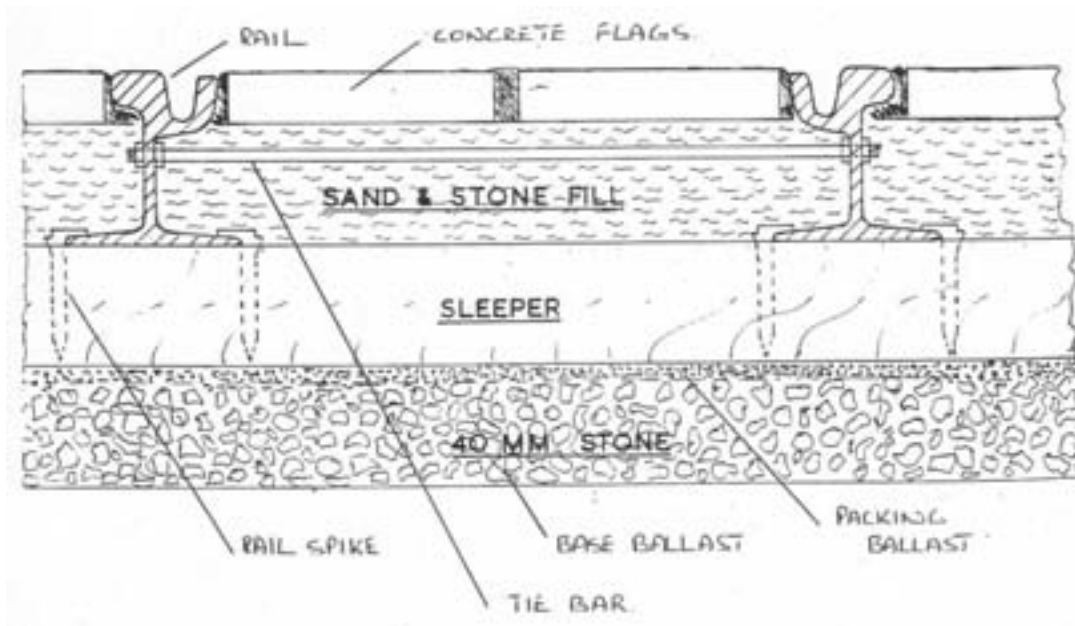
Schematic diagram of Blackpool and Fleetwood tramway grooved rail track construction as used on the Promenade
